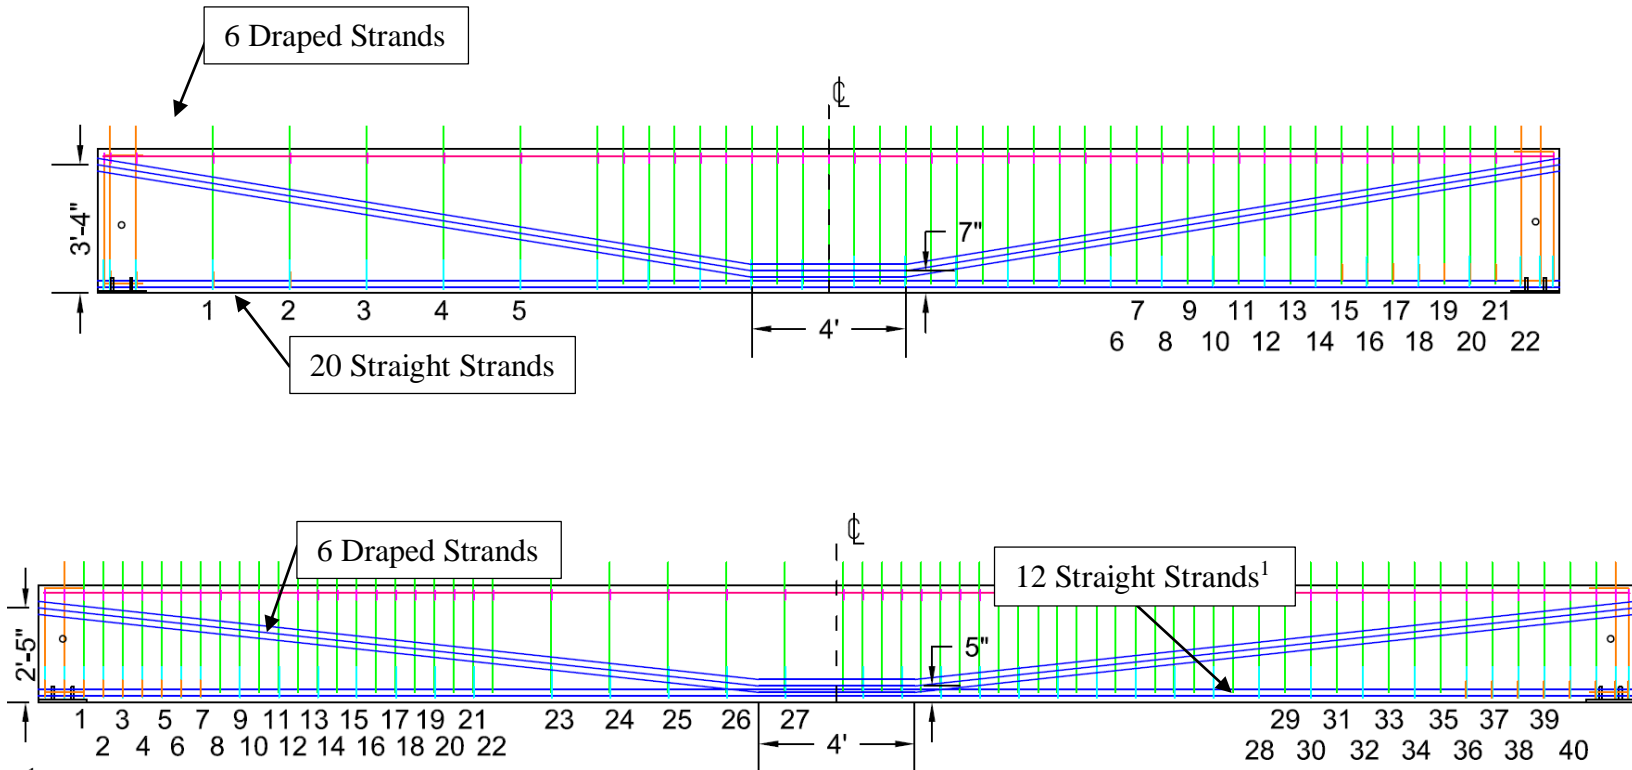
Cross-sectional view of prestressing strand layout and stress levels for 36M girder.
